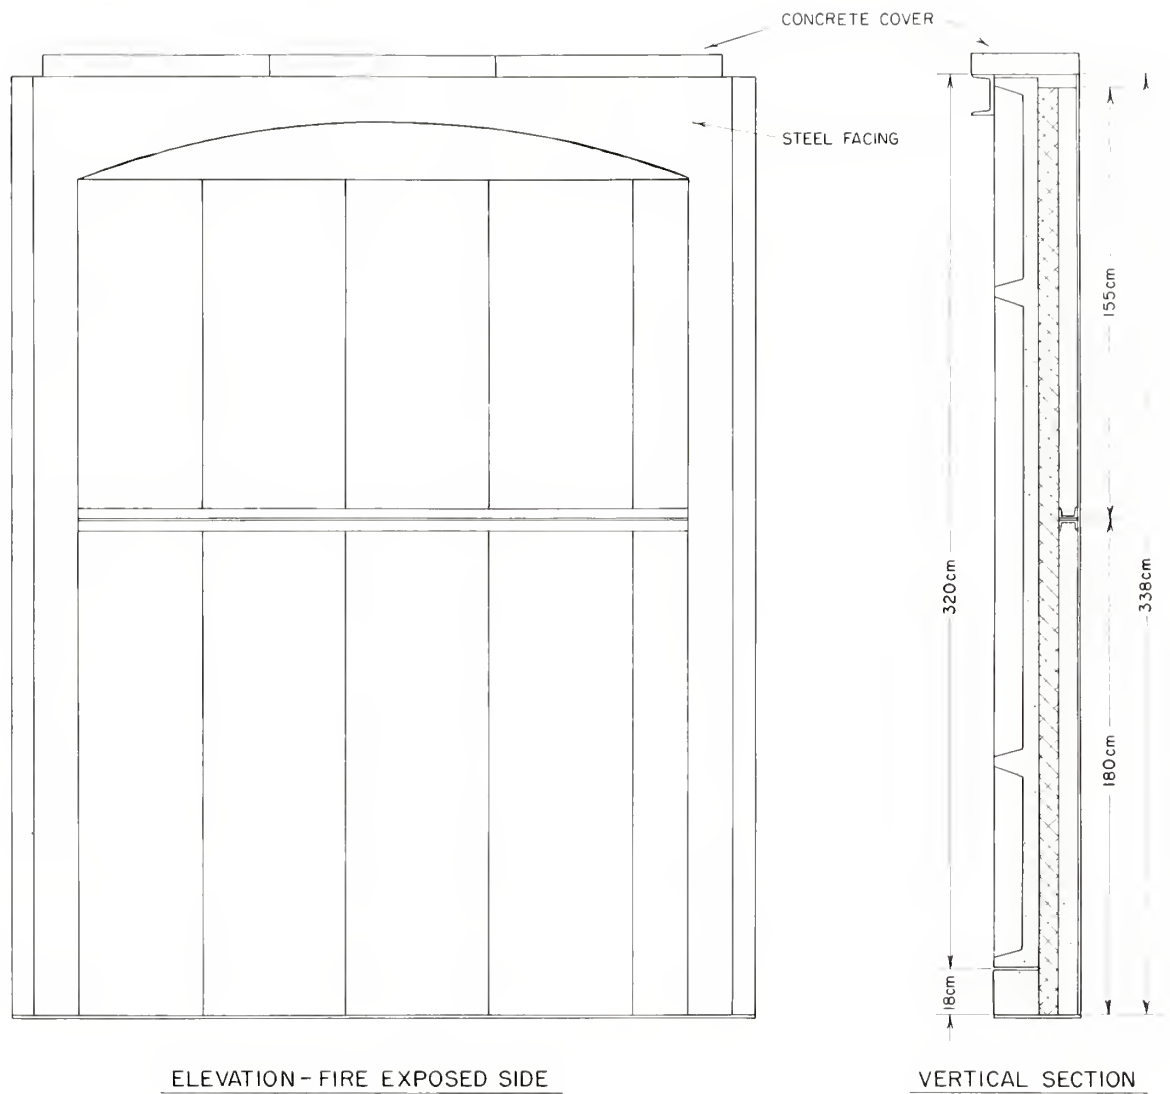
CONSTRUCTION DETAILS OF TEST PANEL NO.2
